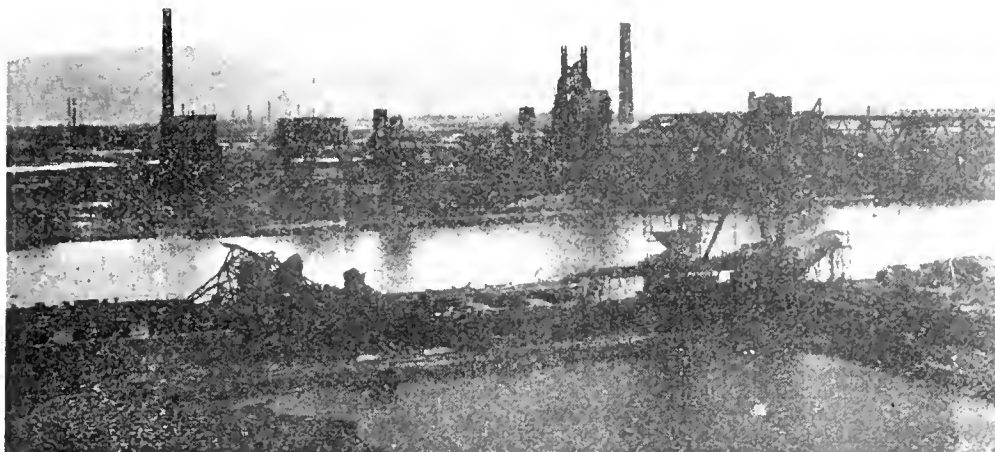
View looking north from top of boiler house showing damaged coal handling equipment with Nippon Oil Refinery across canal.
